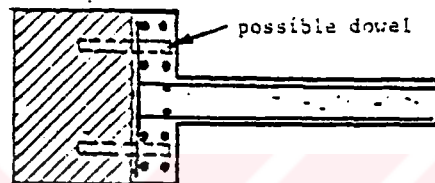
Techniques for connection of in-filling shear wall to the existing columns
